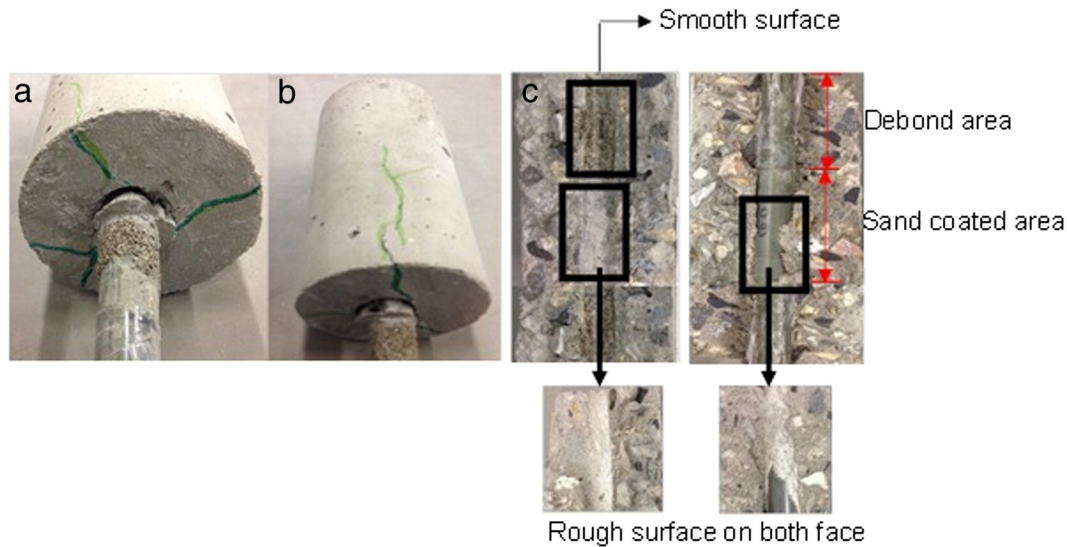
Failure pattern of sand coated bars' (a) radial cracking, (b) crack propagation in concrete and (c) inside view.
